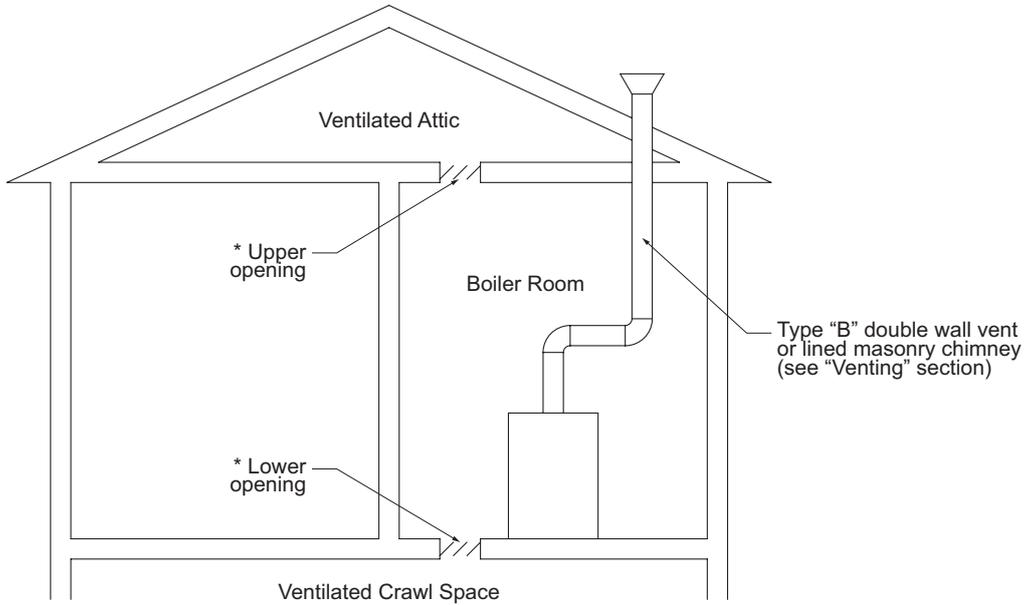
(All air from outdoors, ventilated crawl space and attic)
